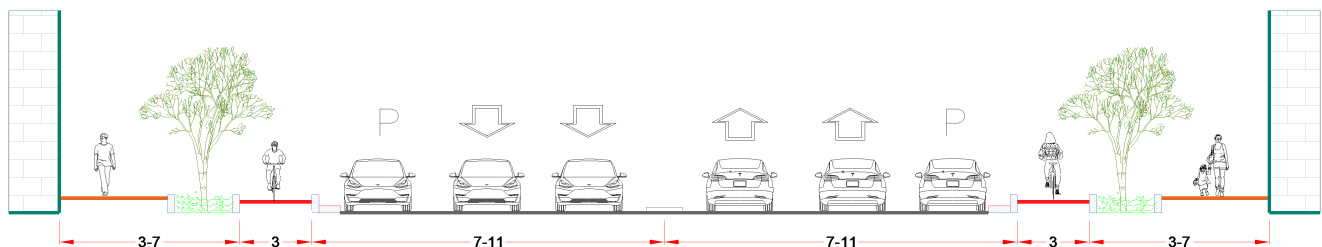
Typical cross-section and dimensioning (m) of one-way bike path (variant A) in the study area.
